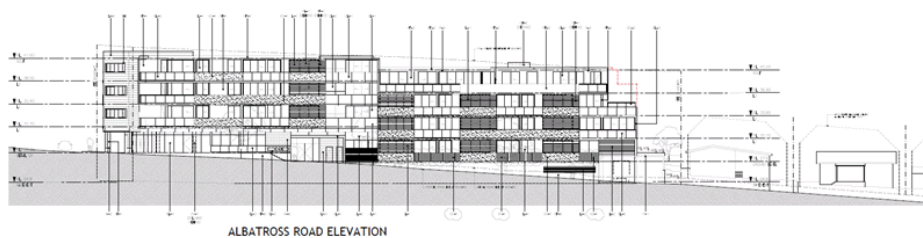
Elevation of the proposed development (western elevation – Albatross Road)
